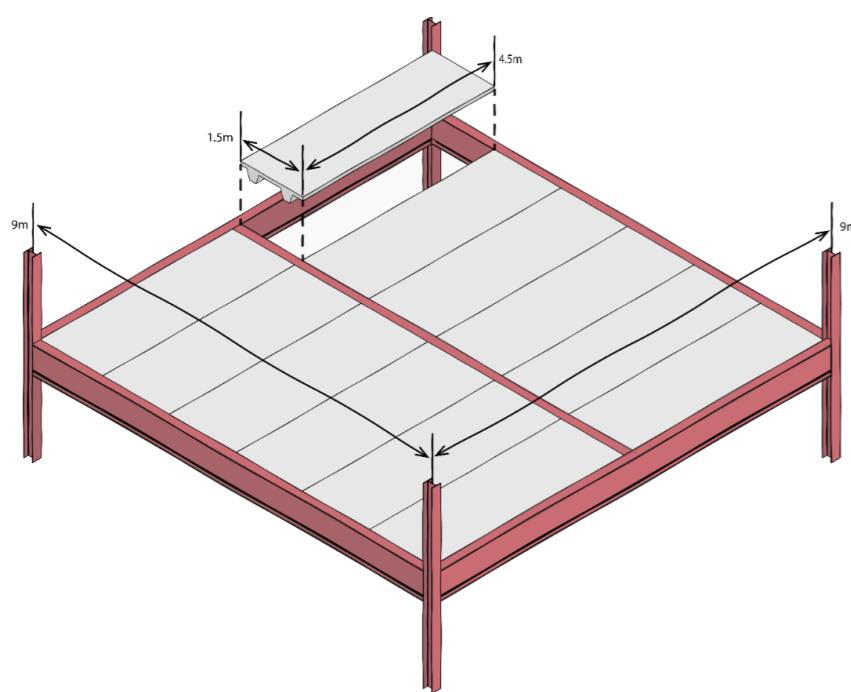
Isometric drawing demonstrating the intended use case for the extracted concrete element
